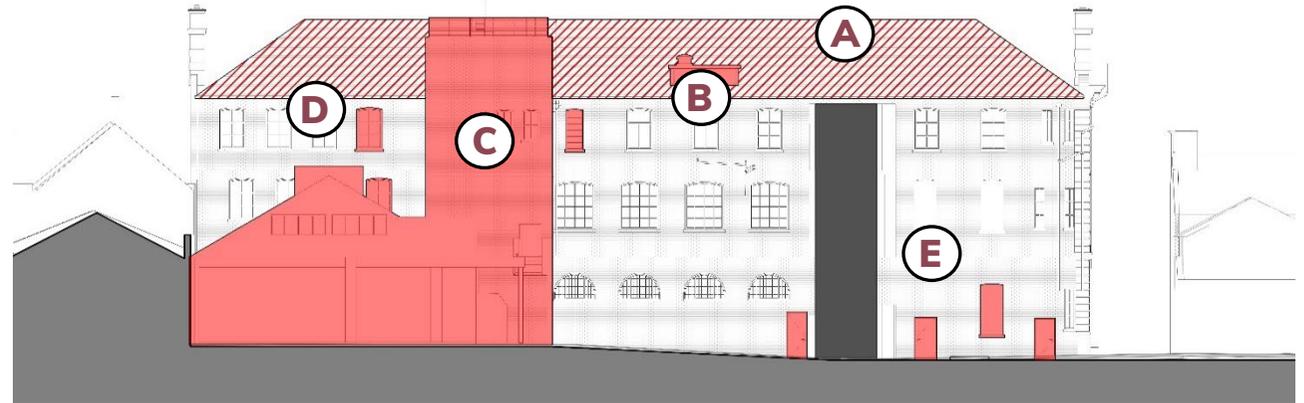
Proposed Demolition, Courtyard Façade, Post Office
